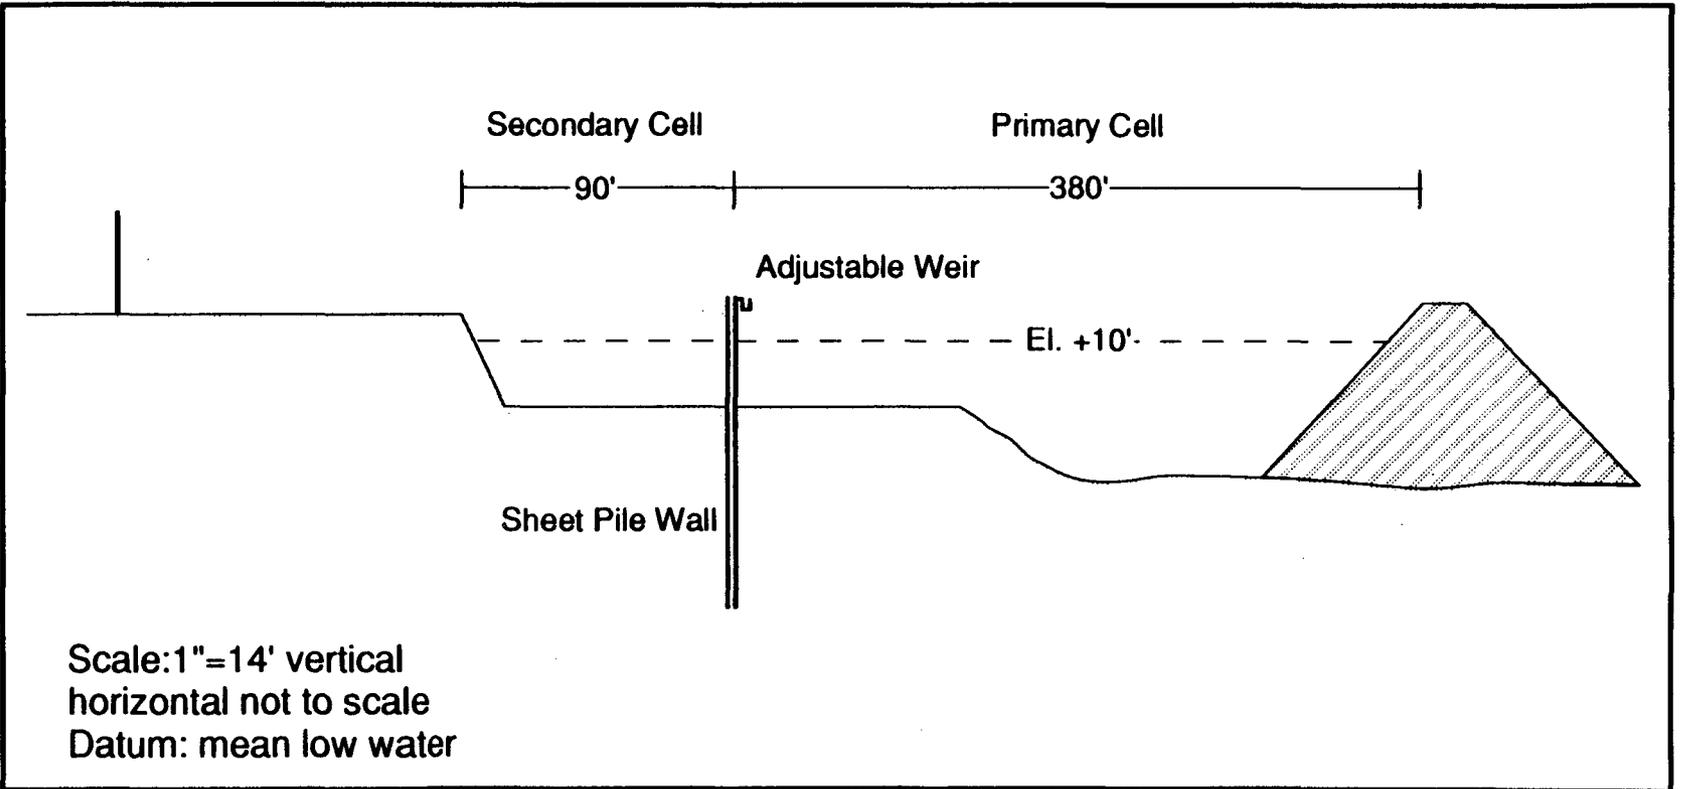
Typical cross section of a Confined Disposal Facility (CDF)
